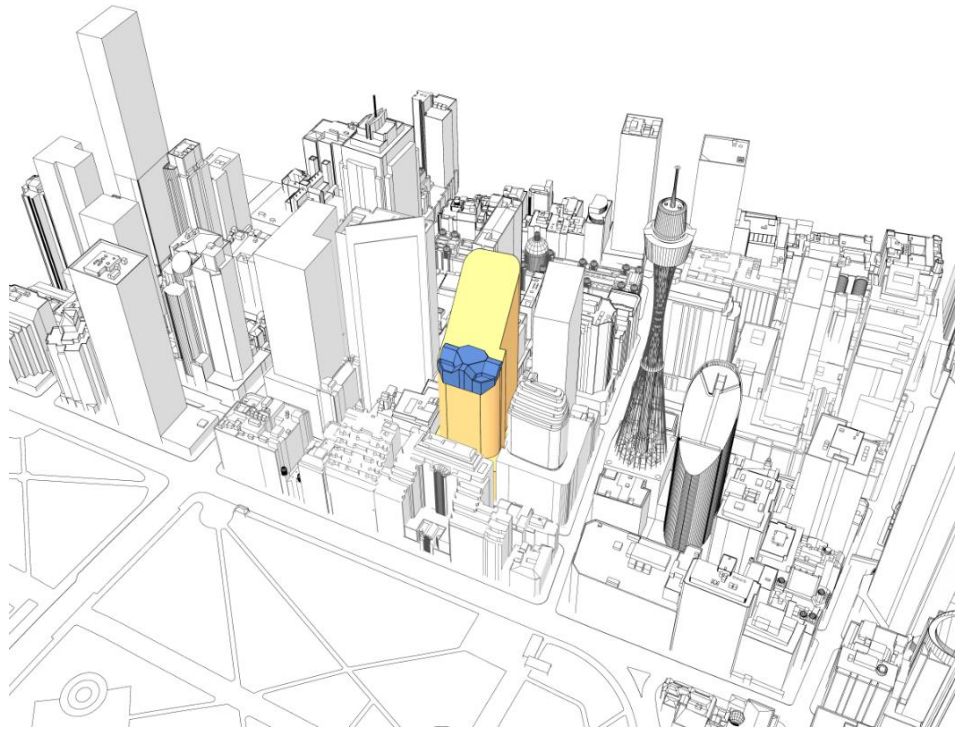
Maximum permissible Draft DCP envelope (with existing building and bridges)
